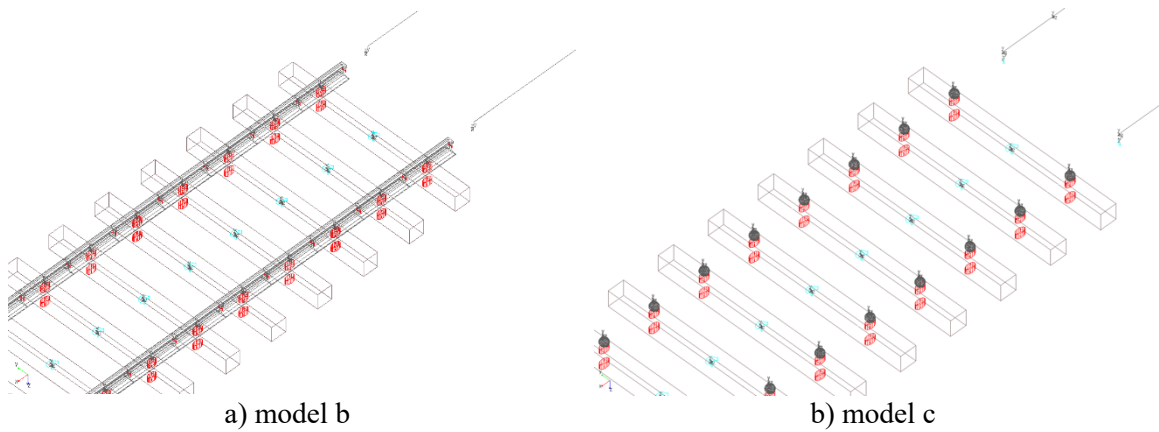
VI-Rail discretely supported track model: a) ADAMS beam; b) MNF.
